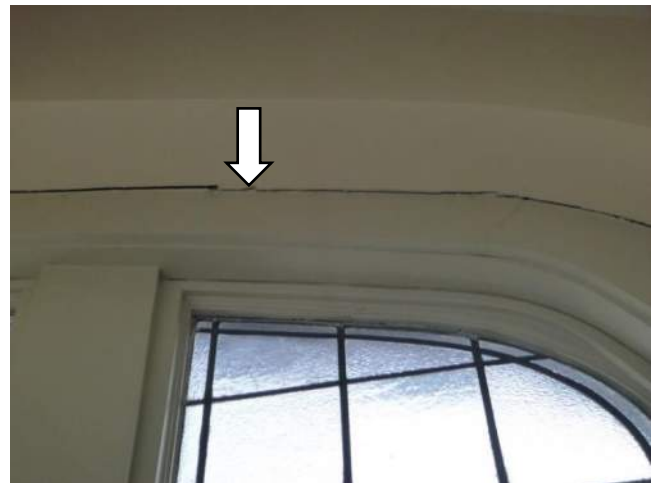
View of separation between the wood trim and the interior gypsum wallboard.
